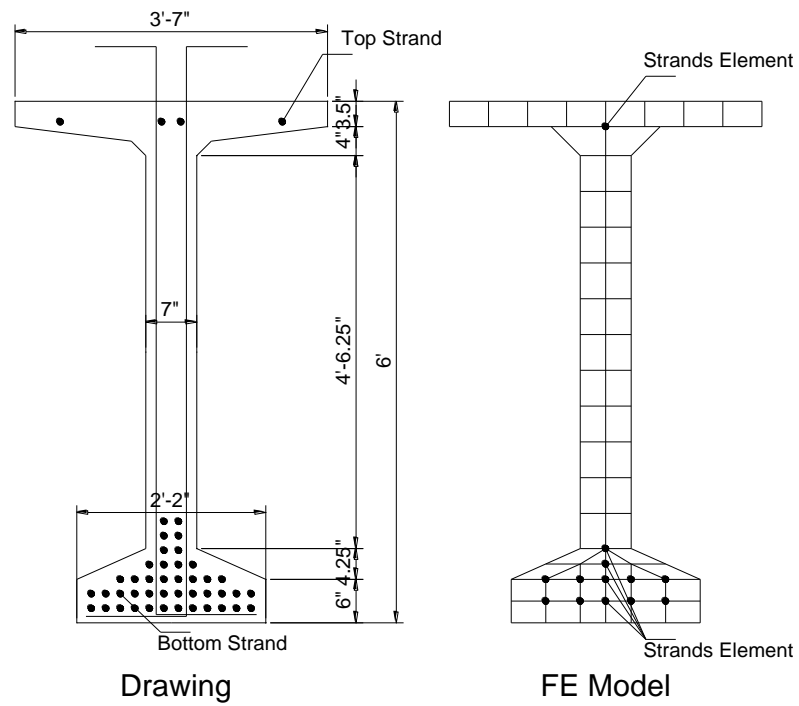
Cross-Sectional View of Archetype 4 Bridge Girder at Mid-Span: (Left) Actual Strands Distribution and (Right) Strand Elements in FE Model.
